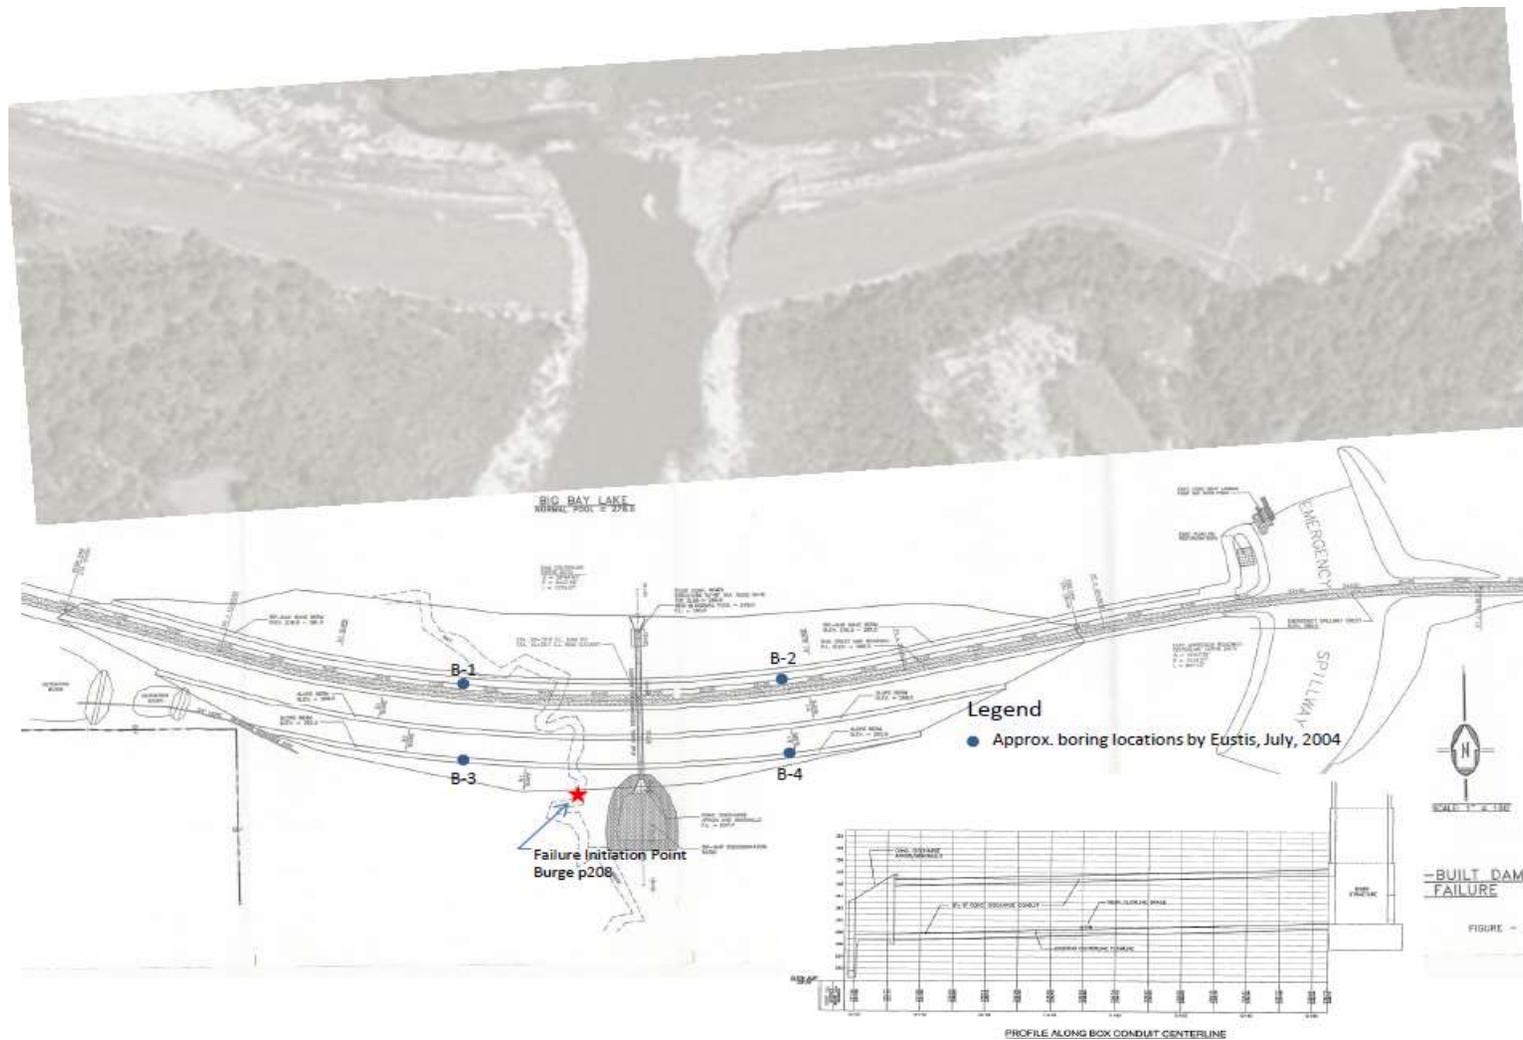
Plan View of Failure Showing Approximate Location Where Failure Mode Breakout Occurred and Original Borings Were Performed
